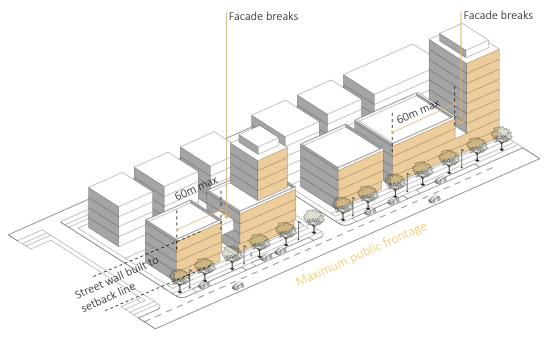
Street wall built to established setback line providing enclosure and creating a visual rhythm
